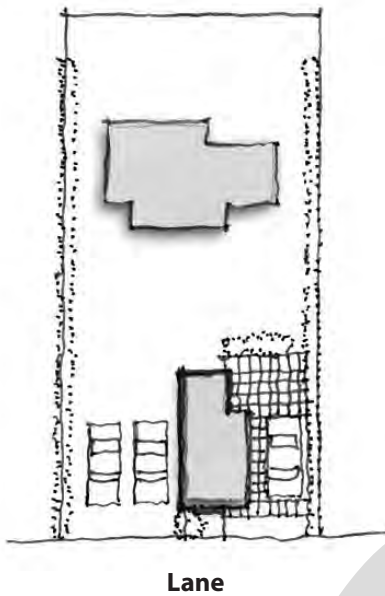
Dedicated coach house parking separate from parking for principal dwelling
